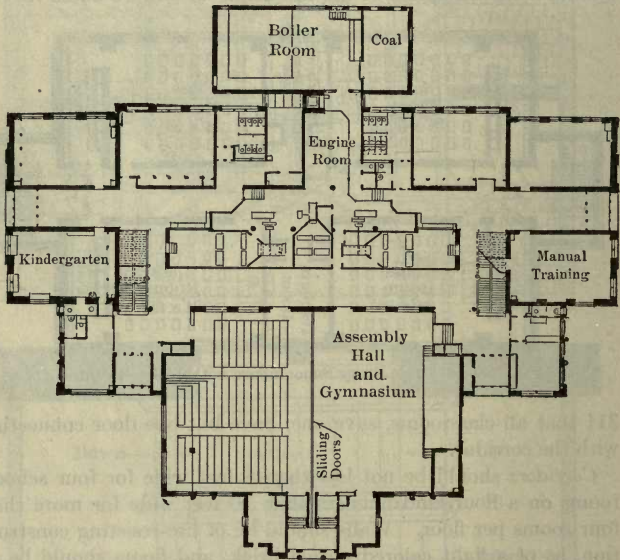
First Floor Plan, Mozart School, Chicago.
